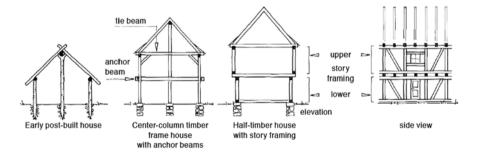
Development of support structures from the post-built house to half-timber construction [25]
